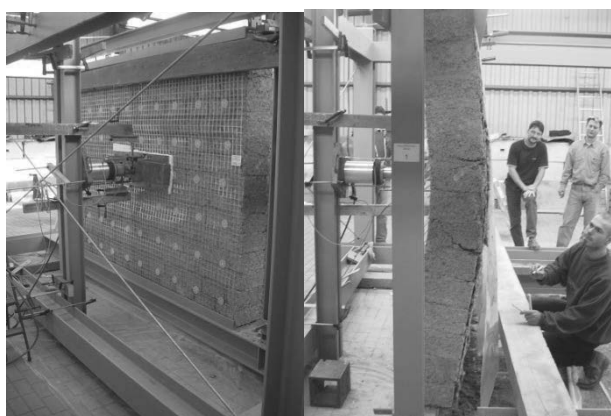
Strength test of geogrid reinforced masonry wall (Burkhardt et al 2005).
